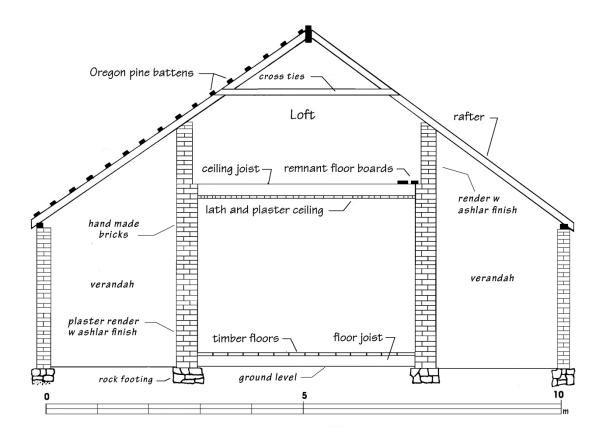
Cross-section of Pontville homestead pre-1950. Height of lath and plaster ceiling over 19th century plank floors is ca 2.83 m. R A Luebbers.
